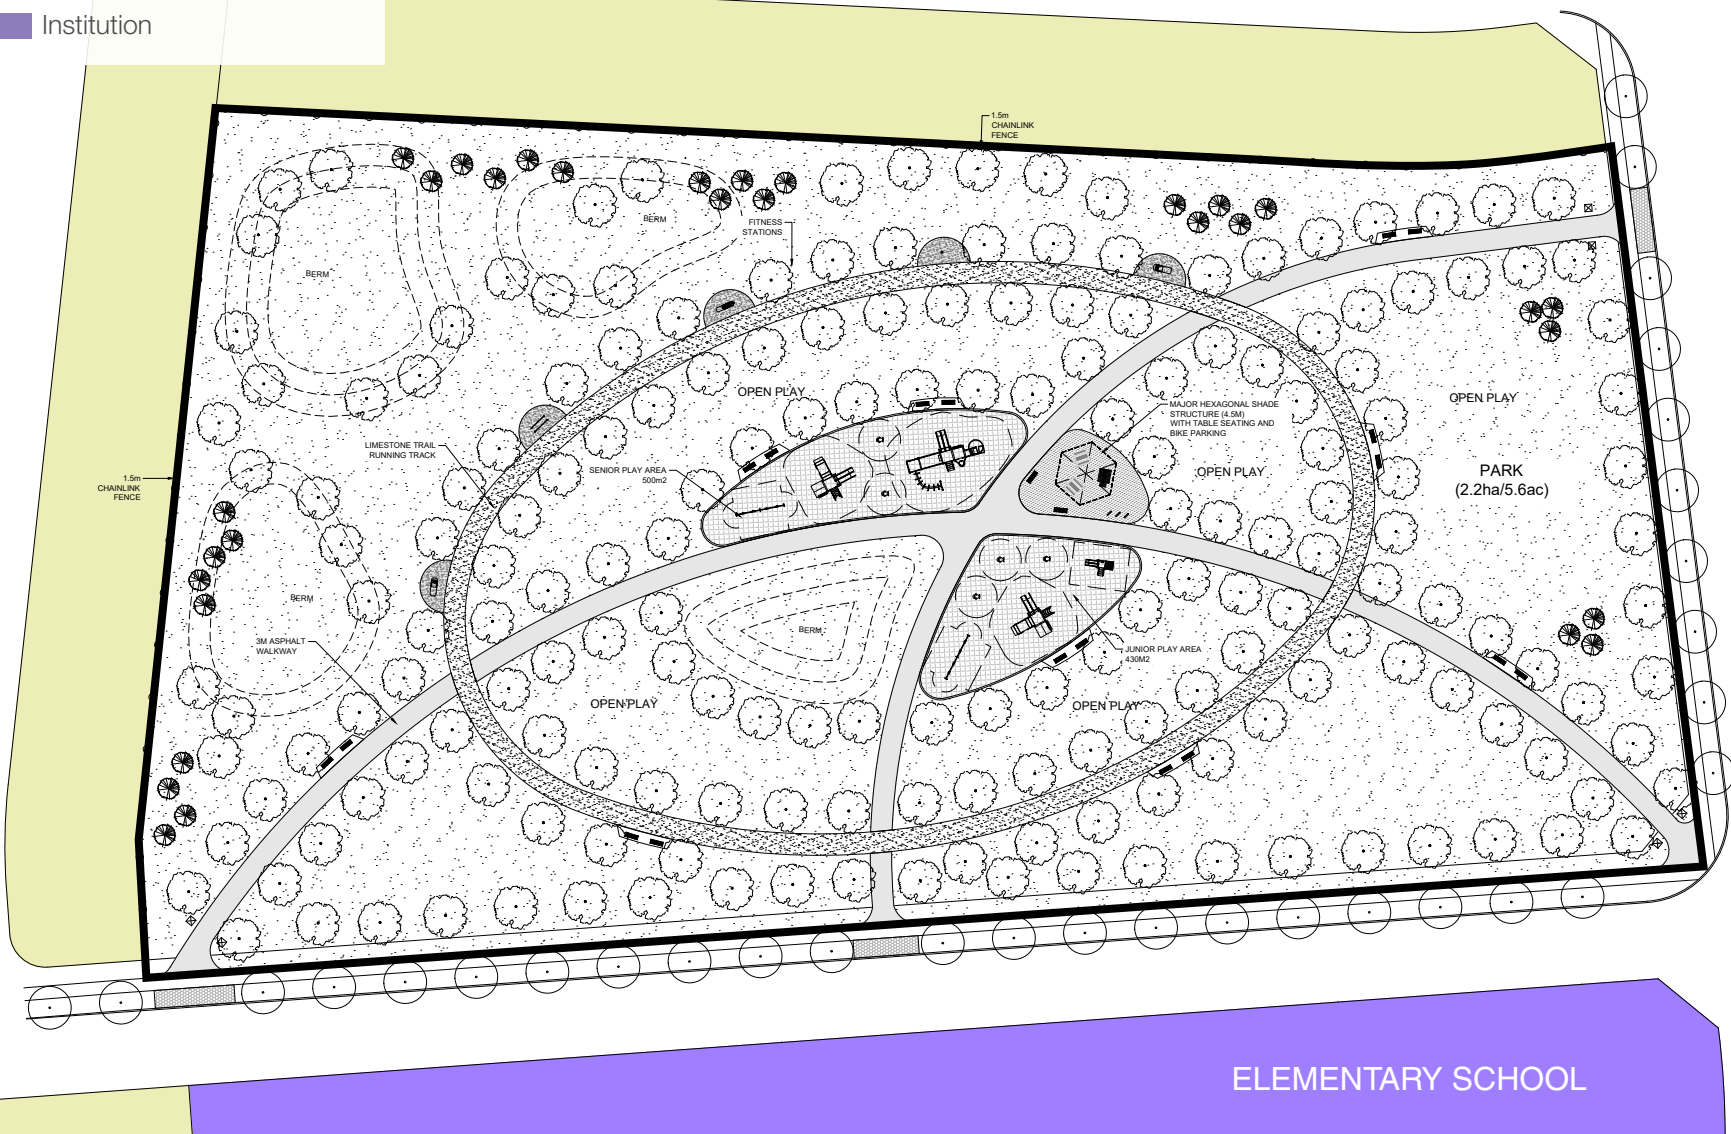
Proposed Neighbourhood Park 2 Facility Fit Plan
